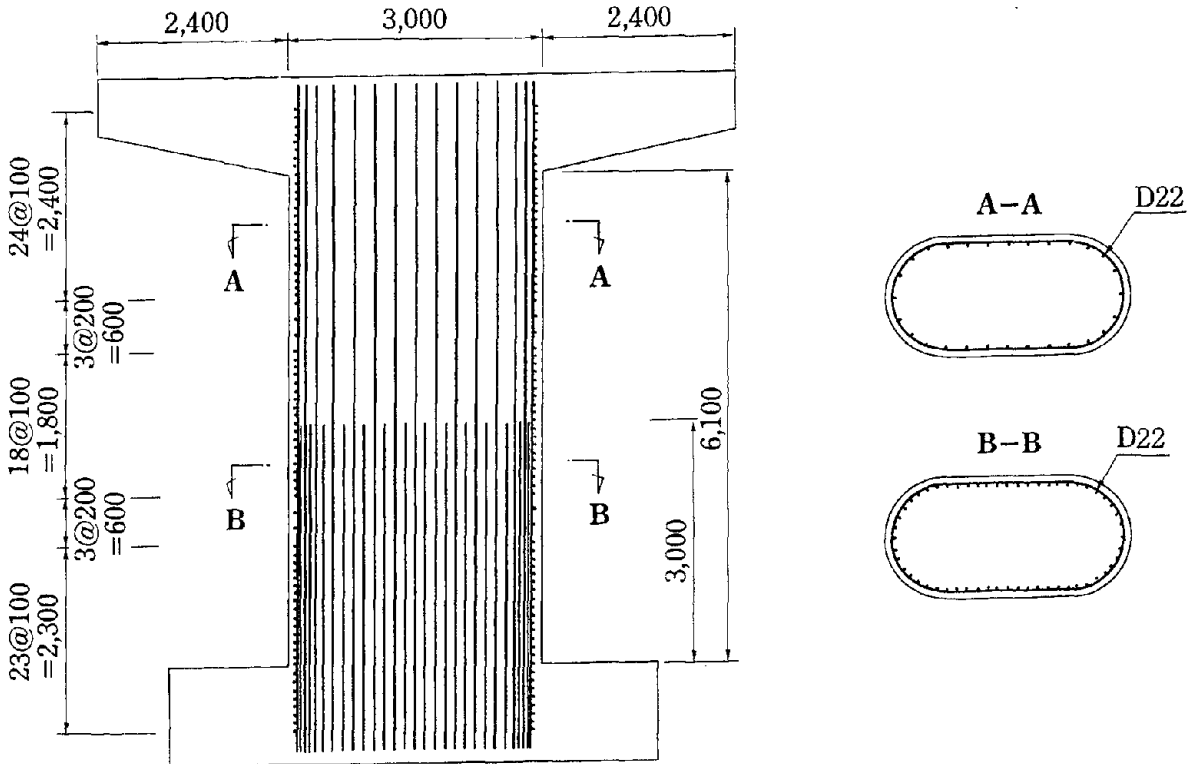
Layout of Longitudinal Reinforcement in Shin-shiriuchi Bridge Pier (New P2)
